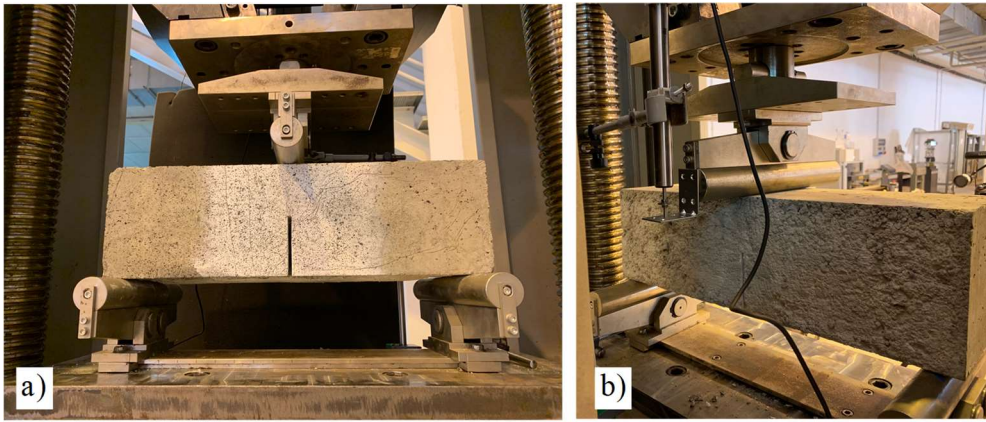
Test setup: a) front view of the specimen in three-point bending test configuration; b) details of the LVDT for the deflection measurement
